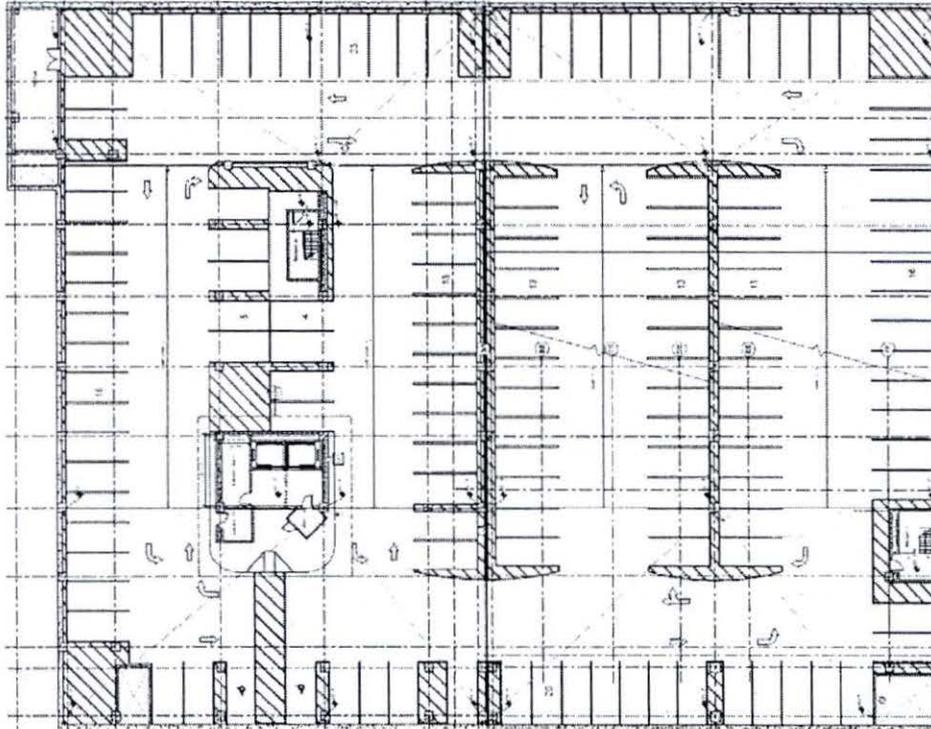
Parking Plans for MITRE 4 Building (P1 Level)
